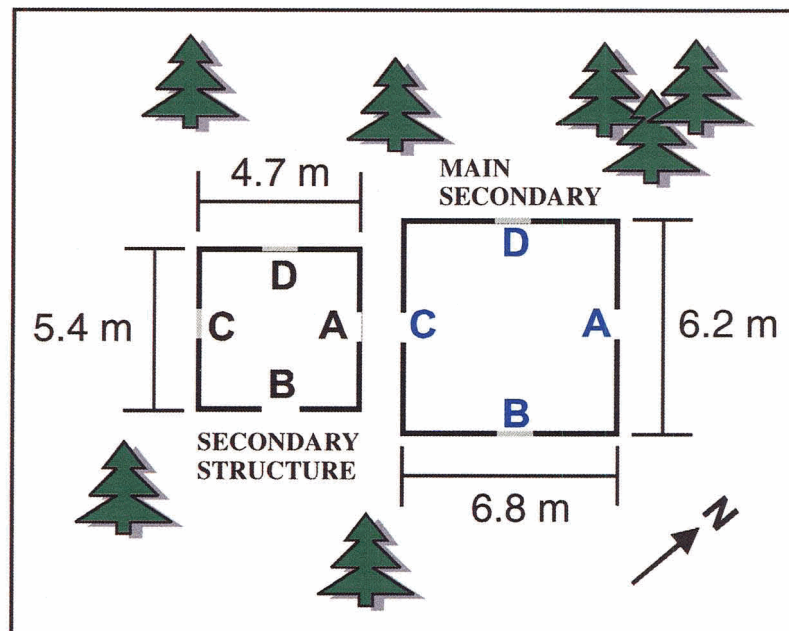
Ewan Moberly Homestead dimensional drawing.
